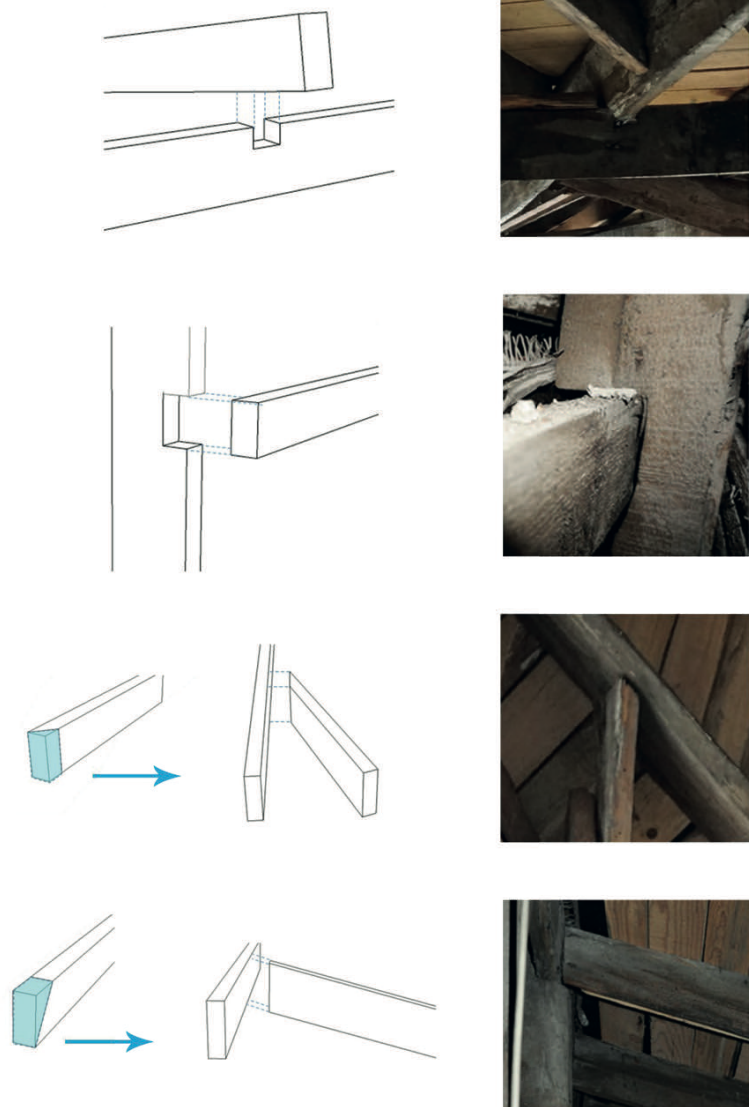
Examples of wood joints from the house in Arnavutköy
